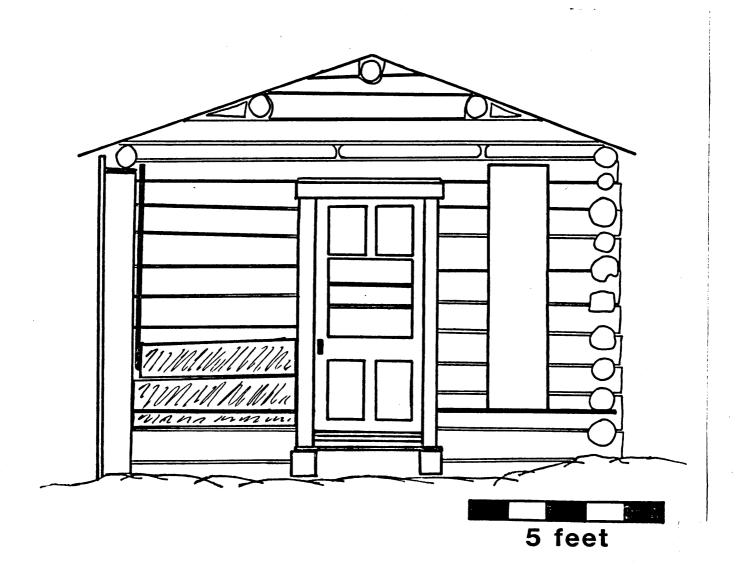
Elevation of the front wall at Feature 12. School bench at left of doorway is shaded.
